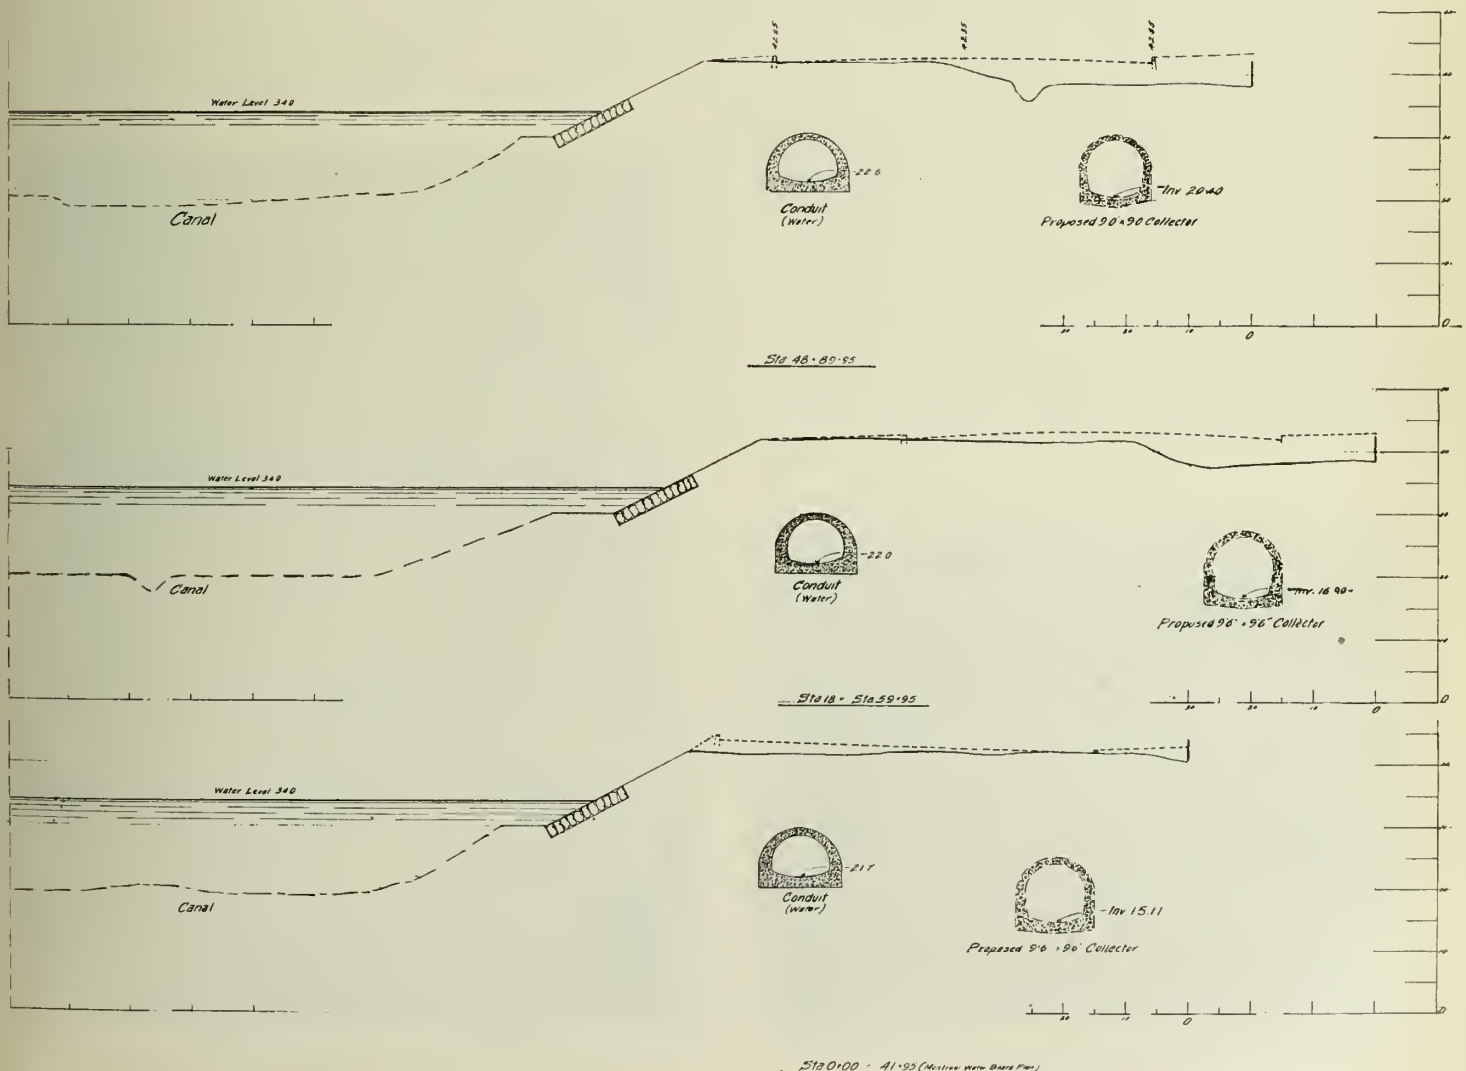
Cross-sections of Aqueduct Bank showing Location of Aqueduct Water Conduit and St. Paul Ward Sewer.
